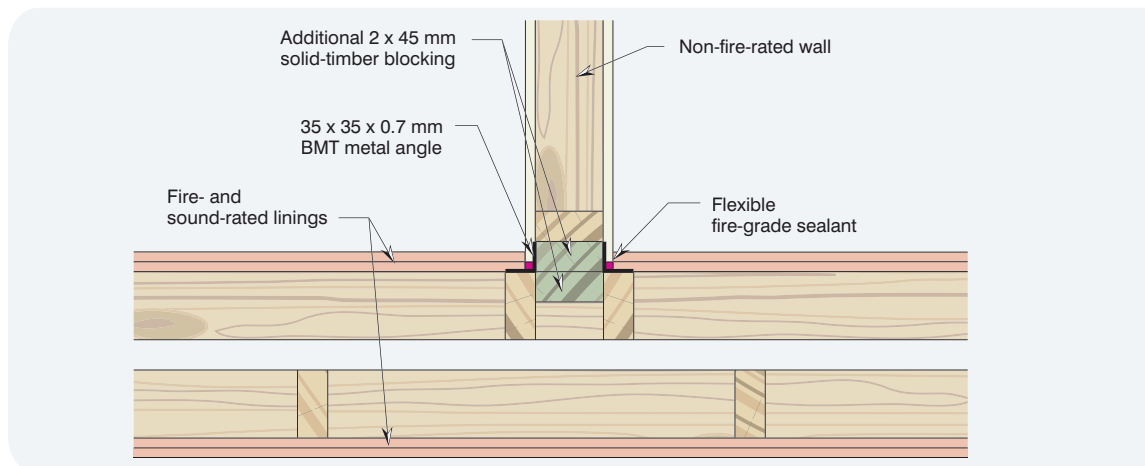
Non-rated wall abutting a fire- and sound-rated wall using metal angles – FRL 90 minutes – plan view.
